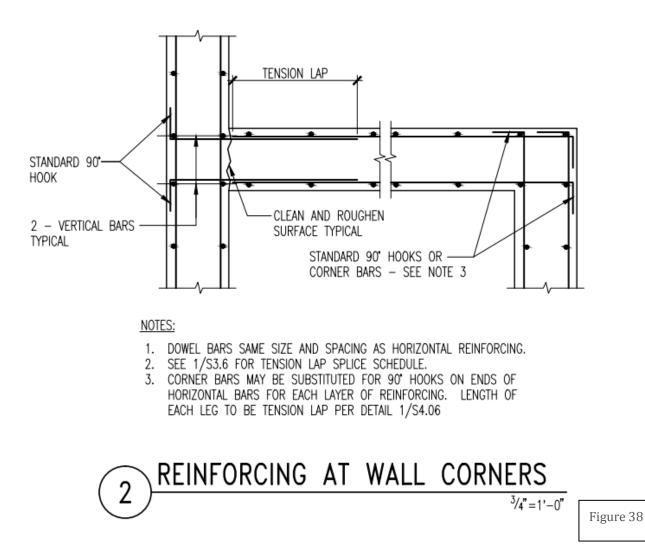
is a diagram of typical reinforcing at a wall corner where a wall meets the edge column. This cast in place connection uses standard 90 degree hooks to extend from the beam to the column making sure all development lengths are met. The two sets of parallel bars are spaced a minimum distance and are placed 1.5" from cover according to IBC 318-11. More joint details can be found throughout the document, ie: lateral systems.
